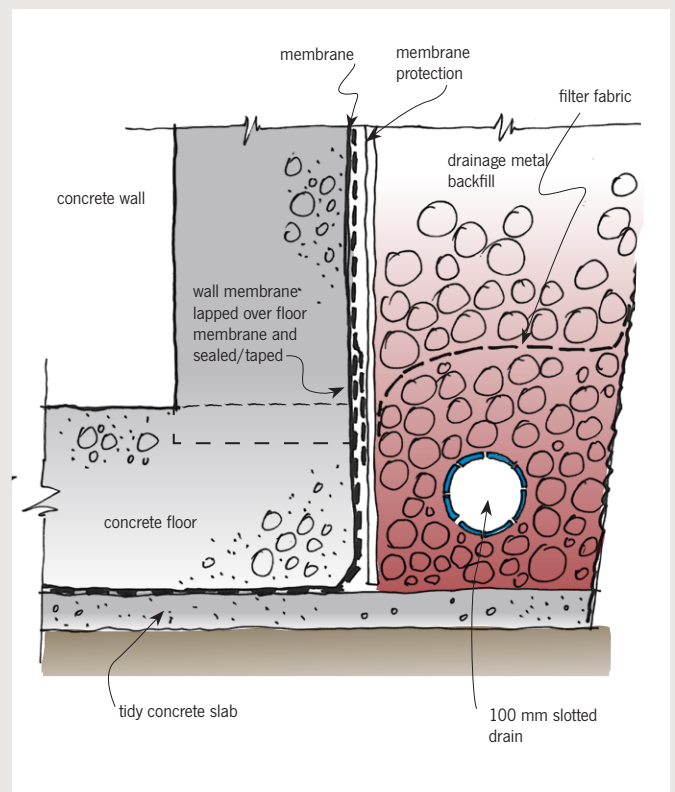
After the wall is cast, the floor membrane is fixed on the wall and the wall membrane is lapped over it and sealed/taped.
